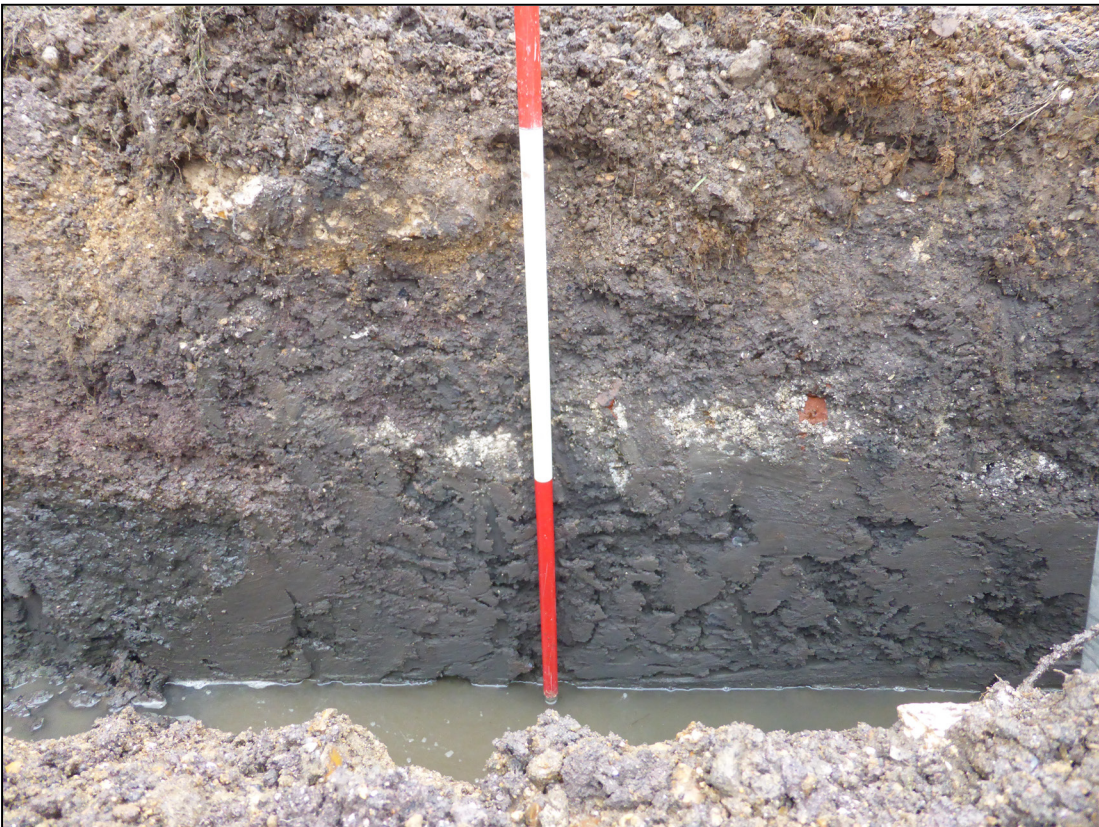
View of soil profile within 0007 close to eastern corner of footings camera facing southeast
